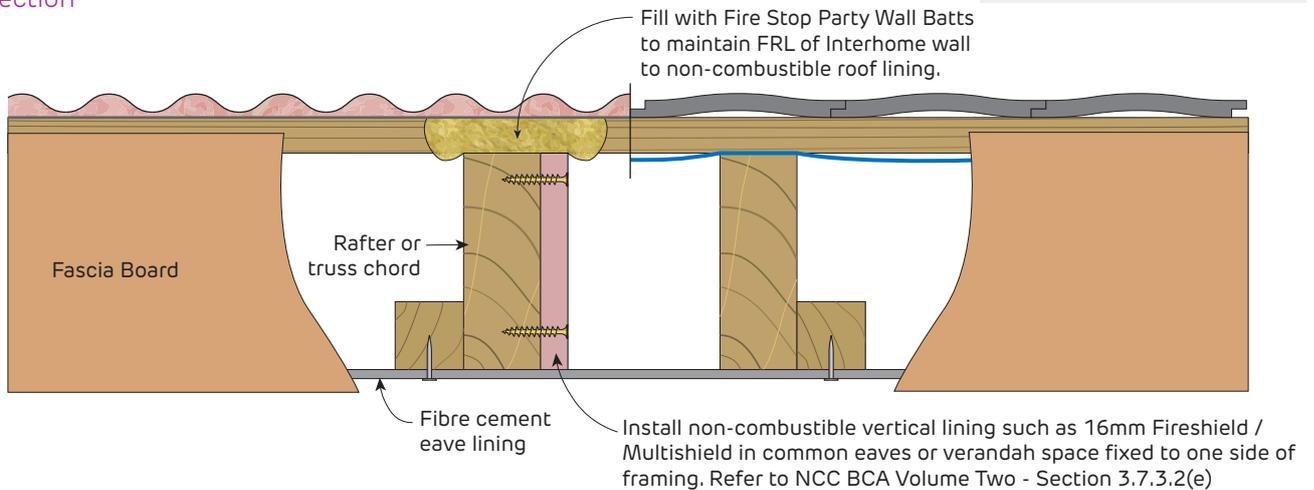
Interhome over Eave End Detail for Class 1 Buildings
